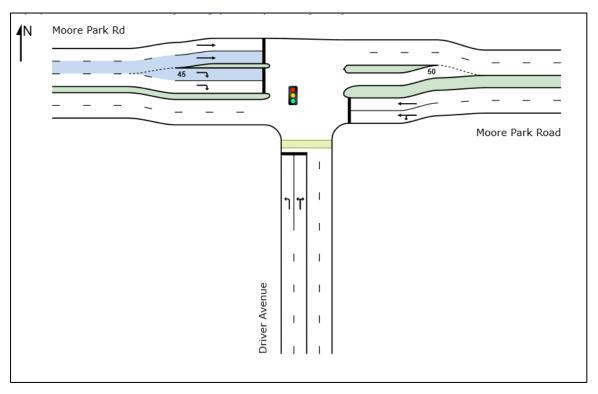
SIDRA intersection layout showing merge required for eastbound traffic
